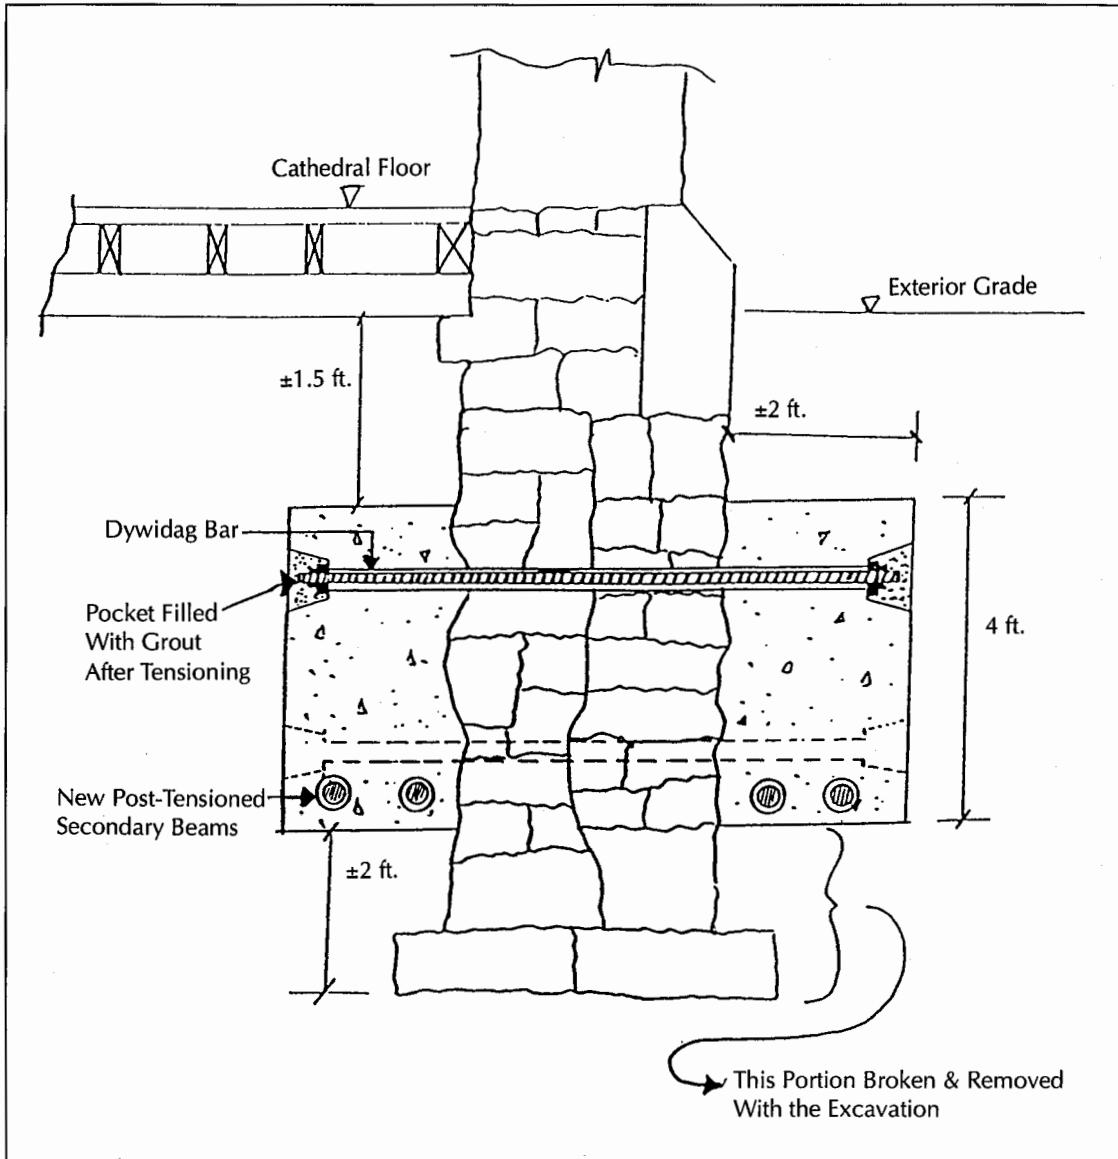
Typical section of the existing foundation walls and column bases showing the load transfer system.
